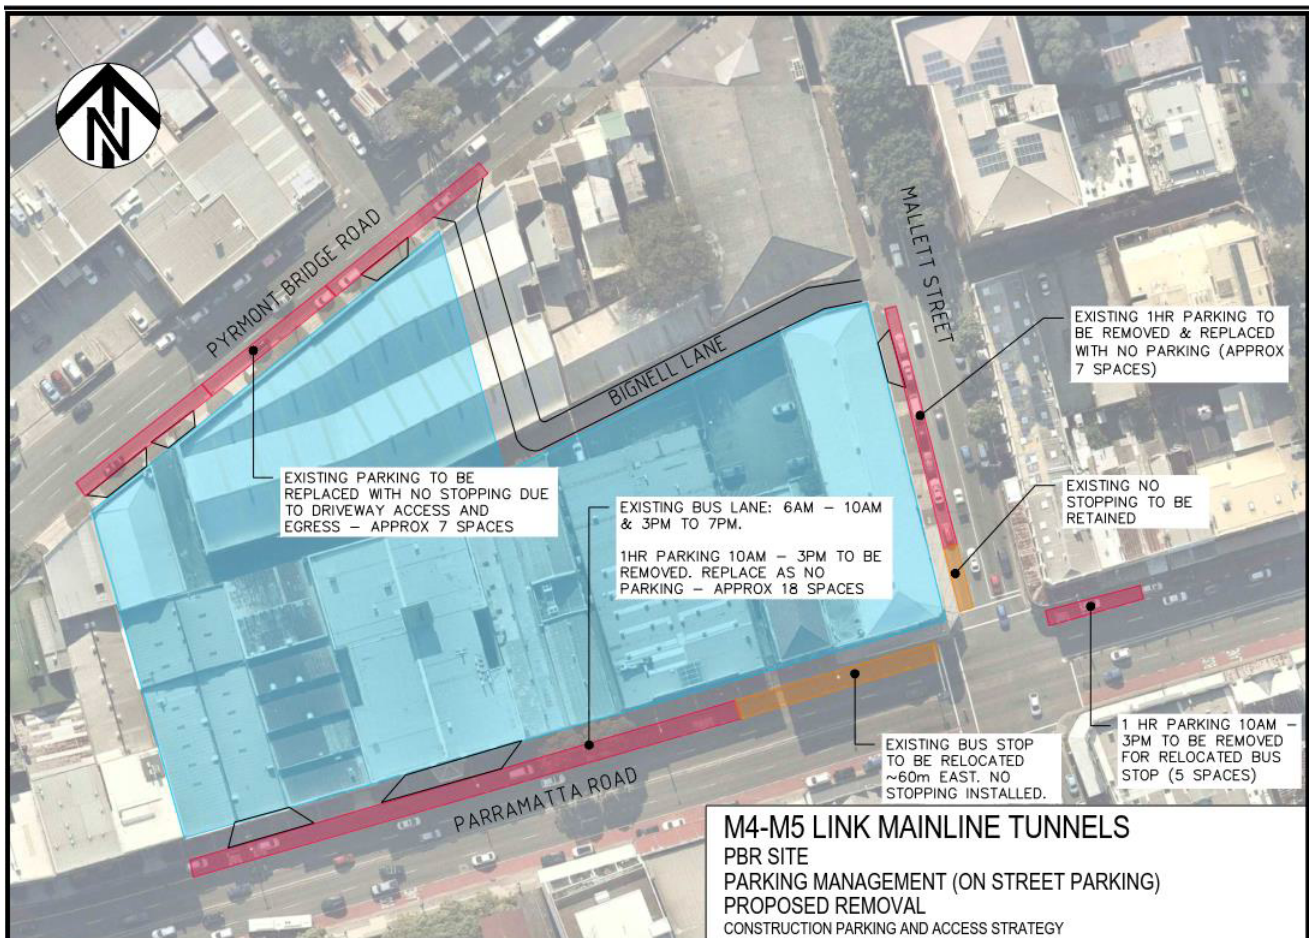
PBR On-street Parking Removal Areas - Pyrmont Bridge Road
